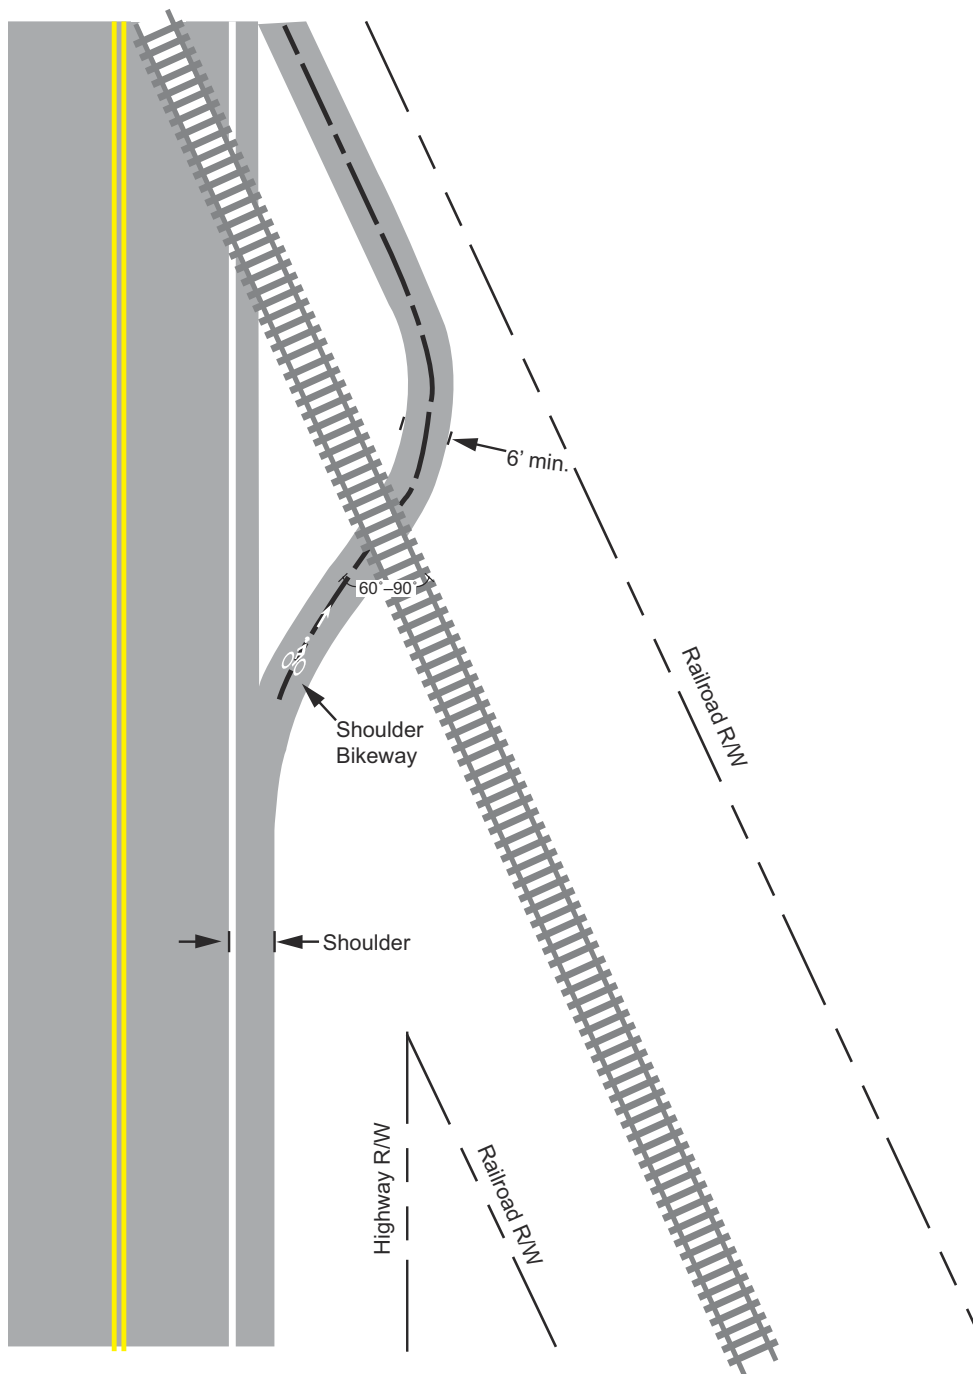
Correction for Skewed Railroad Grade Crossing—Separate Pathway
